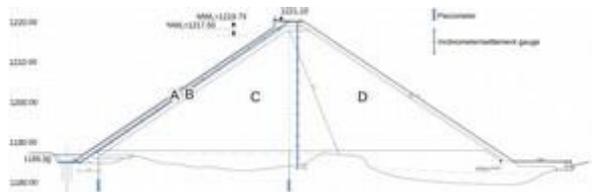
Layout of settlement gauges in cross-section 2-2 of the Montesinho dam.
